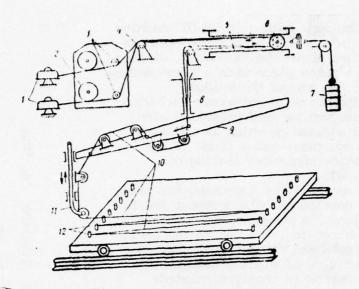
SCHEME FOR THE SM-607 REINFORCEMENT-WINDING MACHINE
